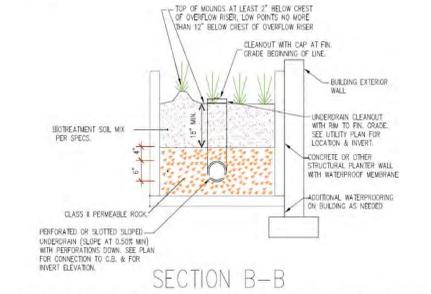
Cross section B-B of flow-through planter, shows cross section of underdrain
